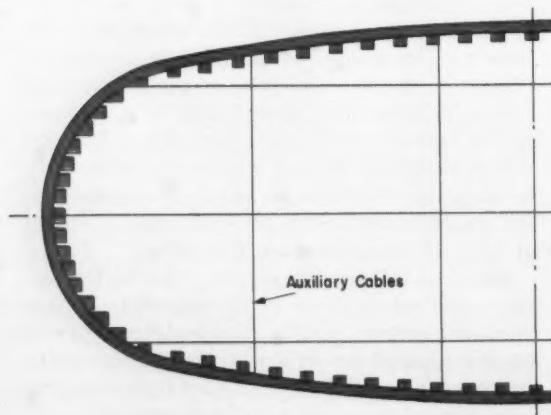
Portable abutments form closed ring which is dimensionally stabilized by auxiliary tension cables.
